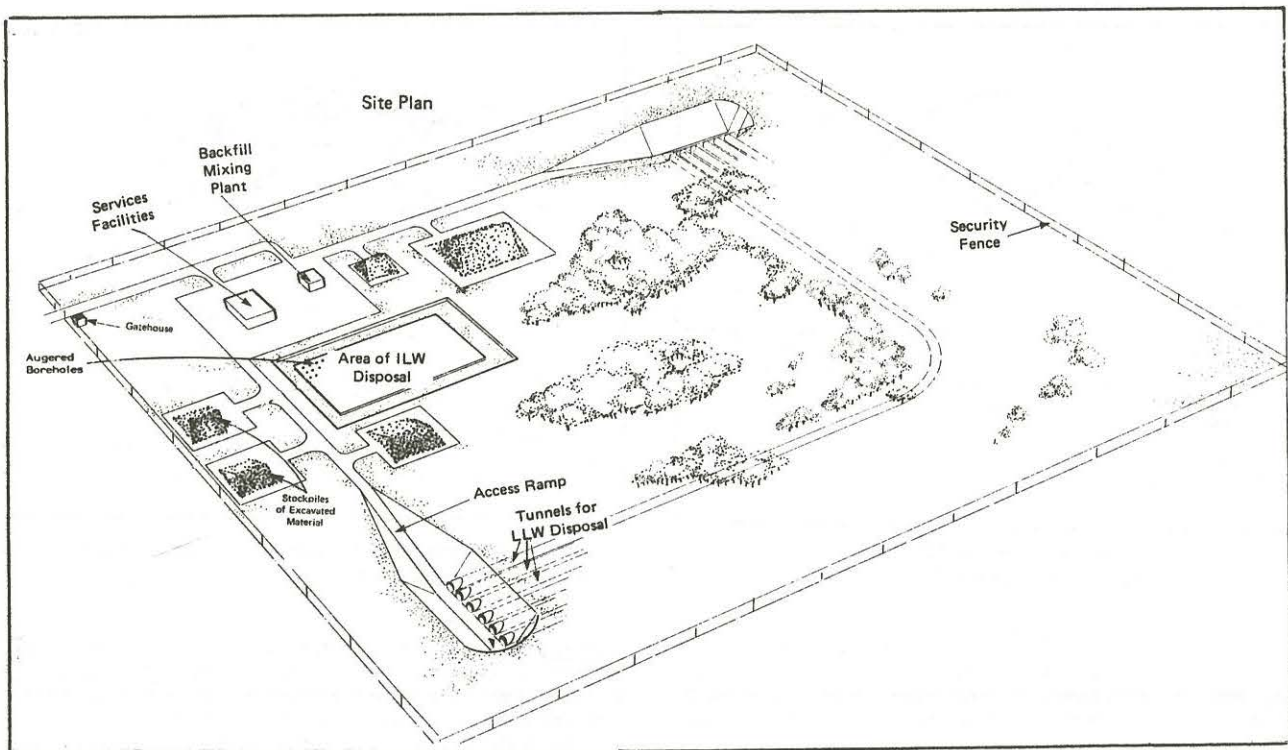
LAYOUT OF TUNNELS AND AUGERED BOREHOLES IN CLAY OR TILL
